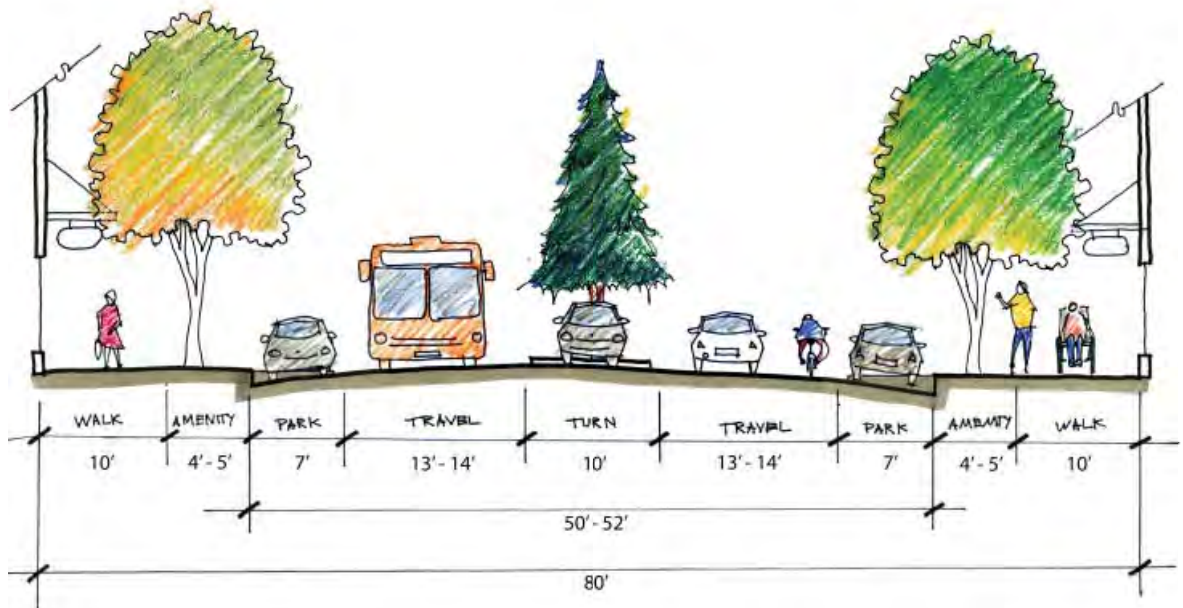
MAIN STREET COMPLETE STREET TYPE DIAGRAM
